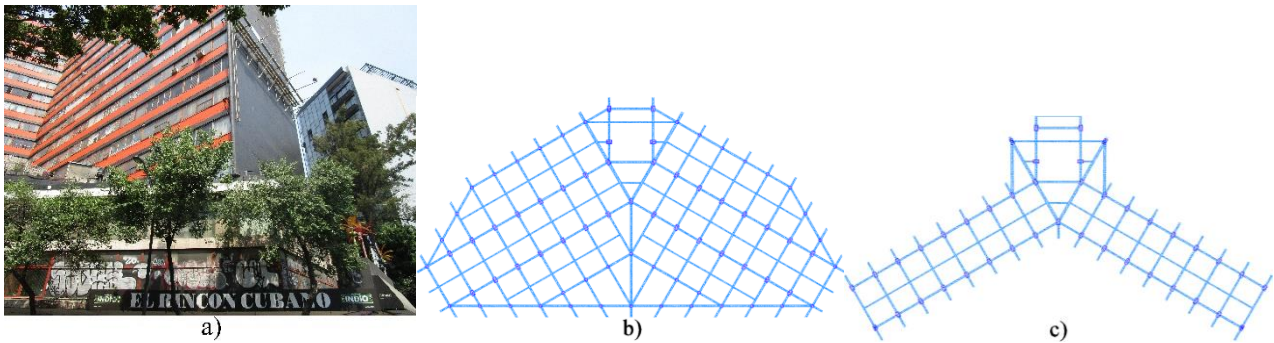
a) Outside view of the building, b) layout of ground level, c) layout of 5th level
